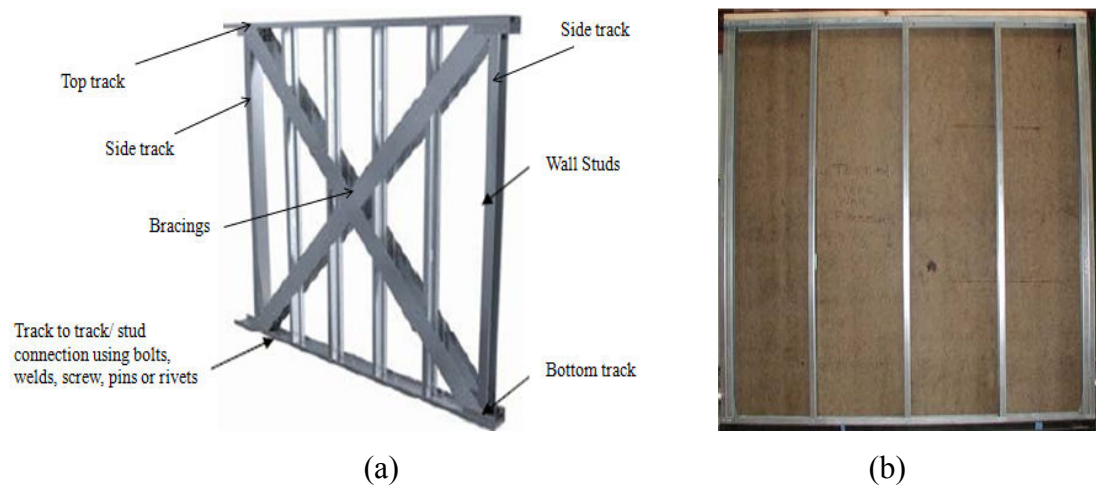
Typical wall assemblies a) wall panel with bracing, b) wall panel with one side sheathing
